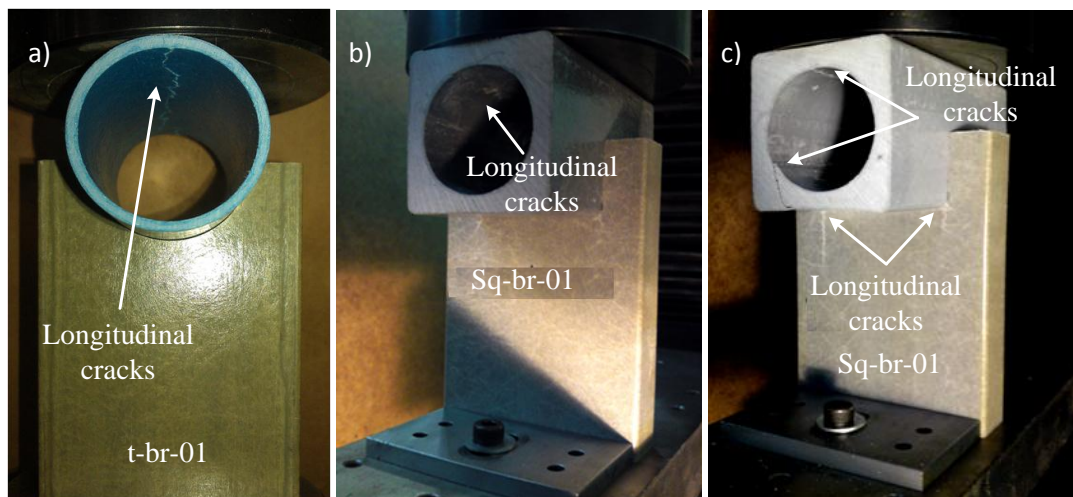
Failures with pin-bearing loading arrangement: (a) failure mode for tube shape; (b) failure mode for square shape at failure and; (c) at post-failure.
